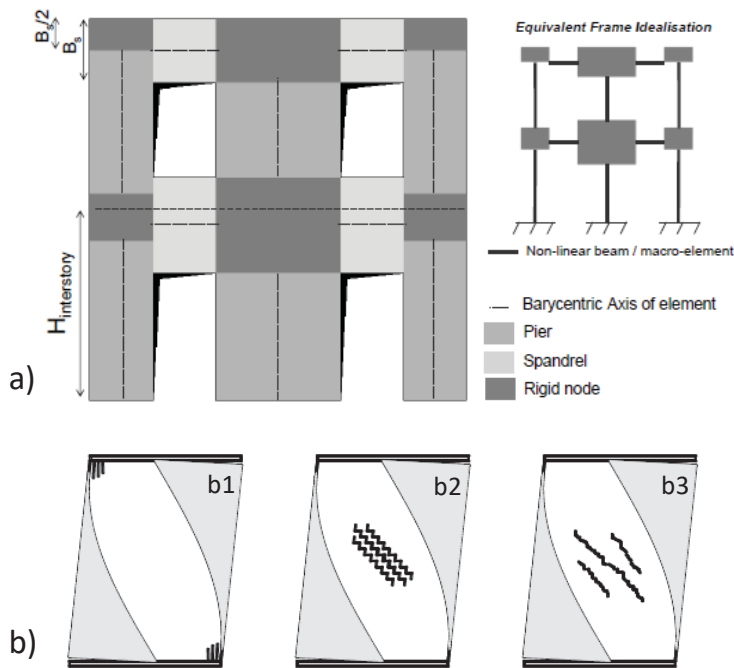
a) Idealization of the equivalent frame of the masonry wall in the case of a regular arrangement of the openings; b) schematization of the failure mechanisms of the masonry panel: banding-rocking b1, shear sliding b2 and diagonal cracking b3 (modified from Lagomarsino et al., 2012).
